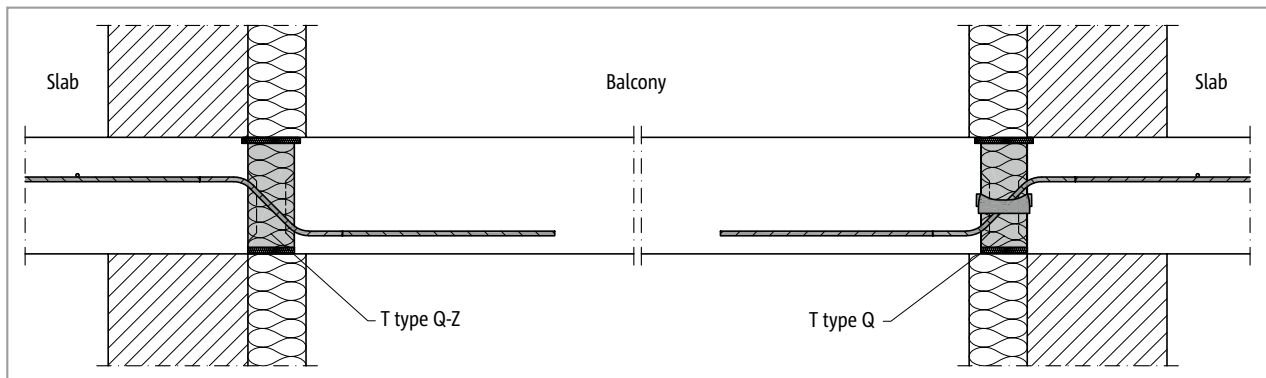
Schöck Isokorb® T type Q-Z, Q: Application case one-way reinforced concrete slab
